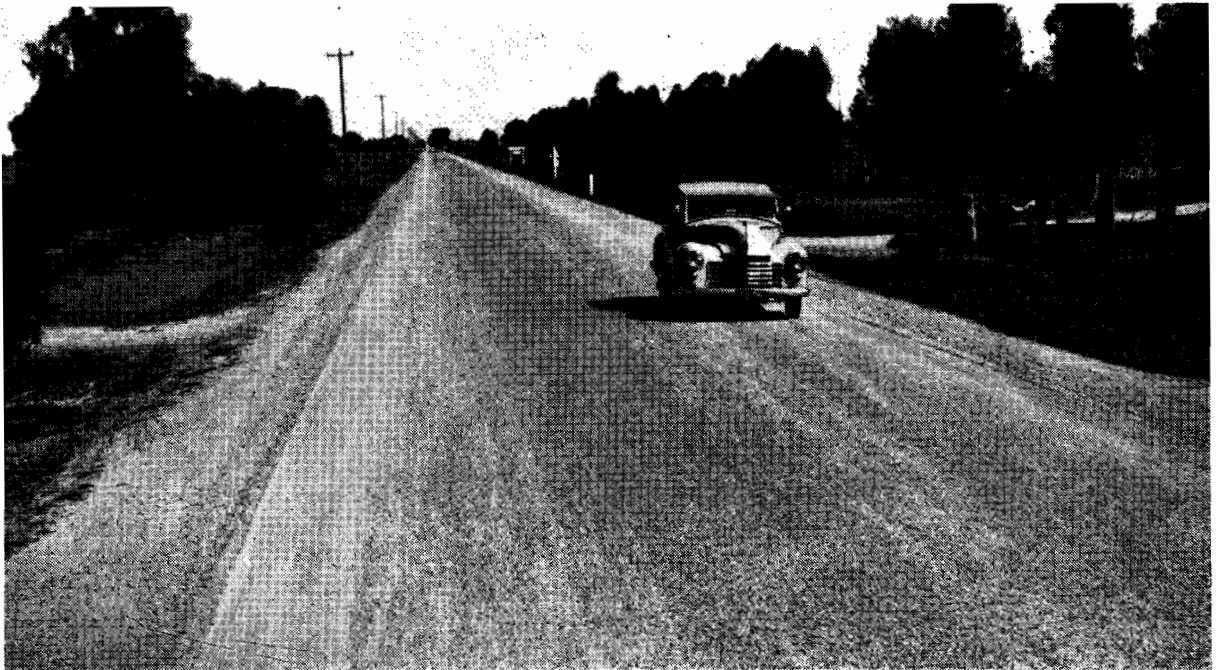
Goulburn Valley Highway. Strengthening and sealing of weak rough section South from Strathmerton.
